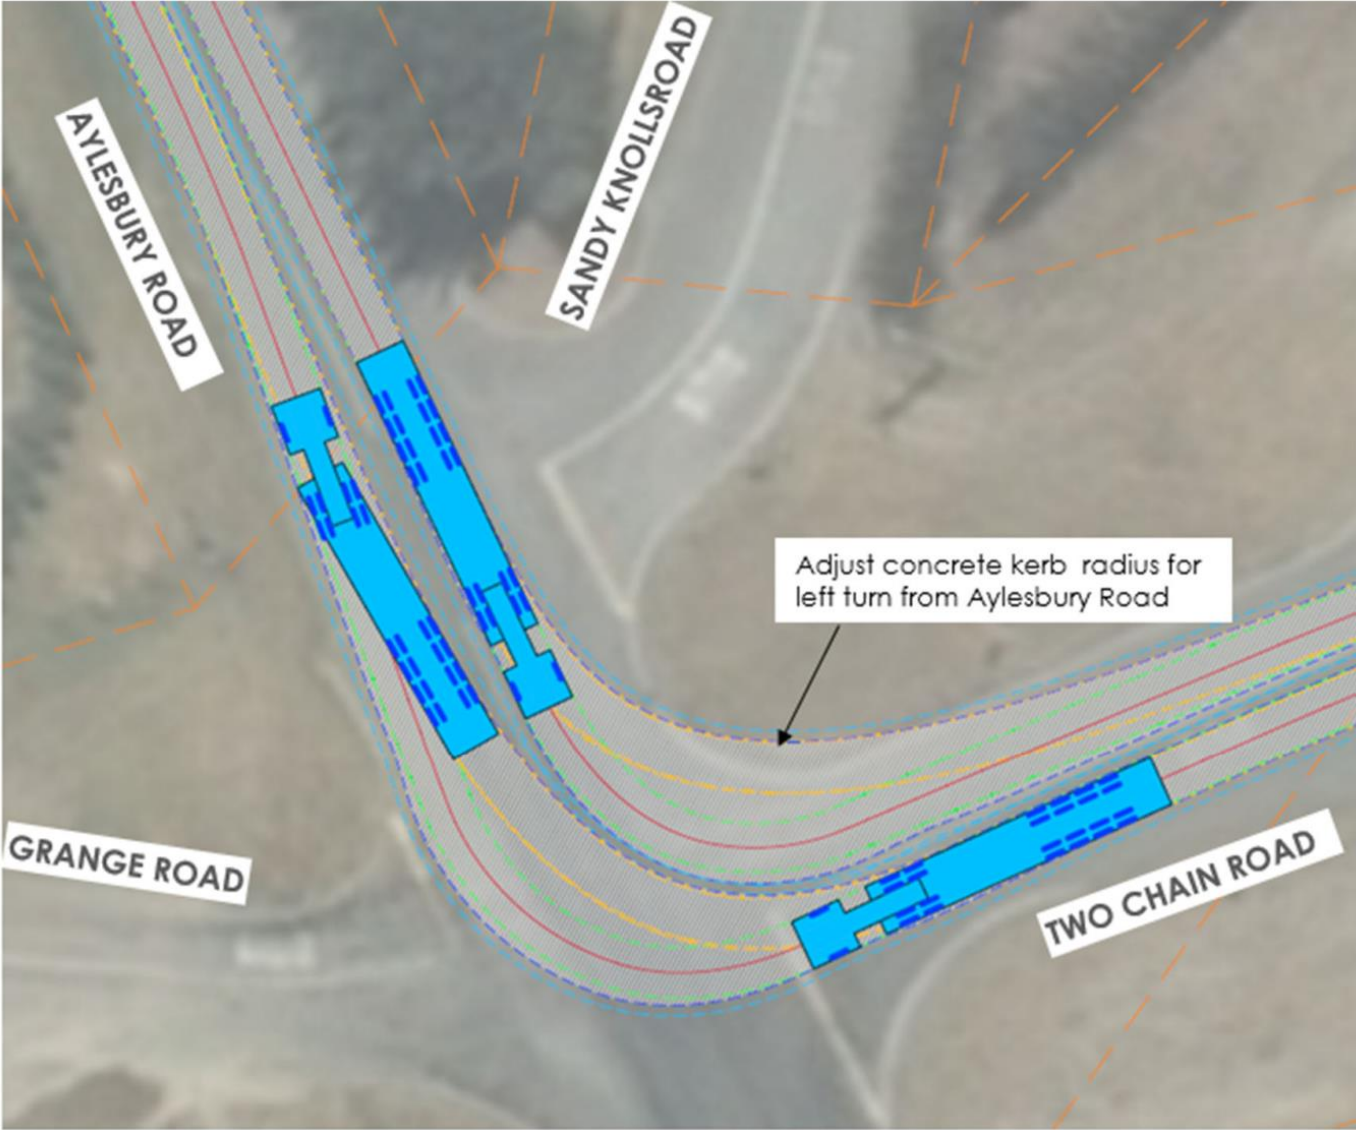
Adjustment to Aylesbury Road – Two Chain Road northeast corner kerb
